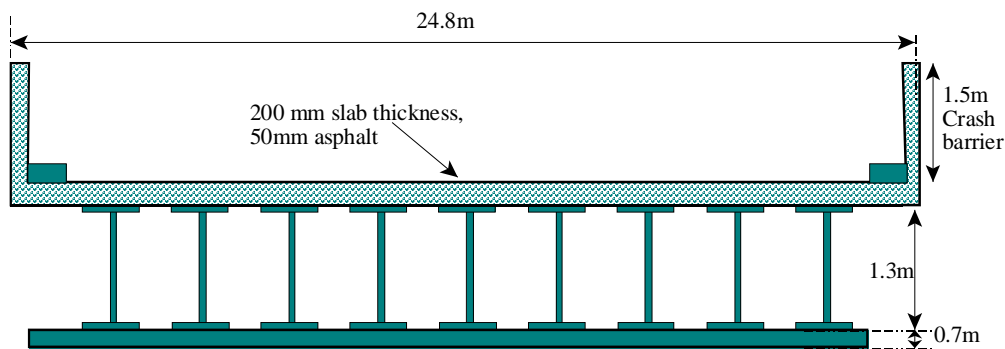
Schematic of the Showa Bridge deck (adapted from Iwasaki, 1984)
